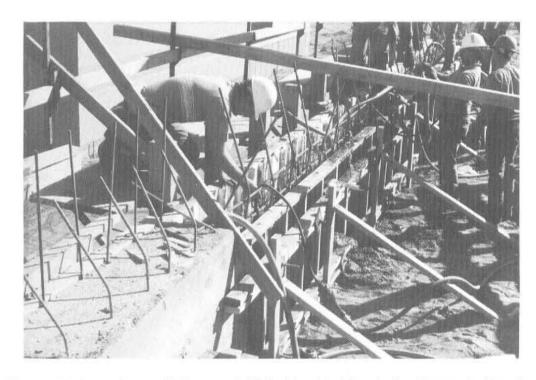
Long Internal Vibrators Initially Used to Vibrate the Concrete Panels.
